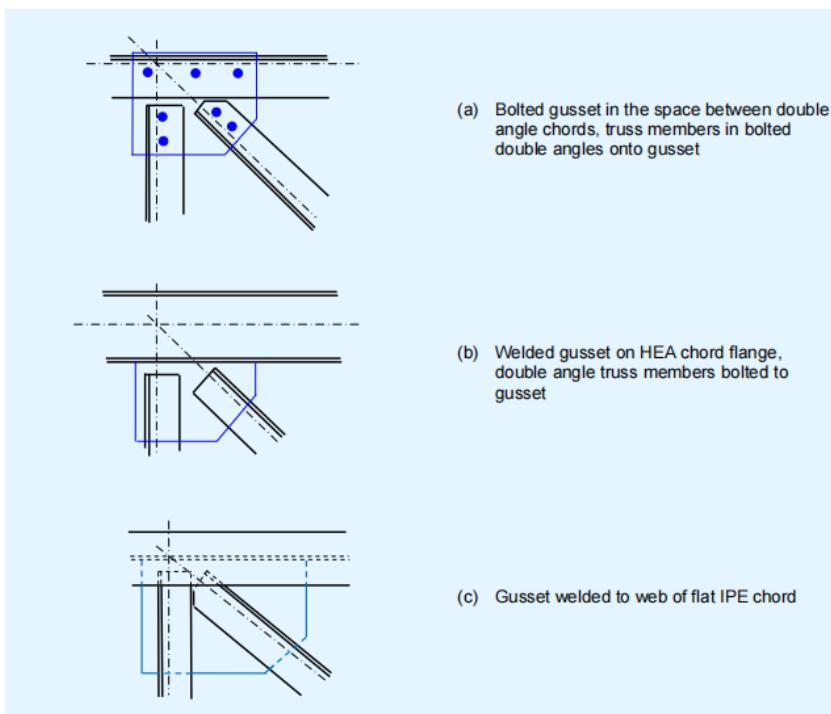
Truss connections on chord. Retrieved from Figure 5.5 of Single-Story Steel Buildings Part 5: Detailed Design of Trusses, p. 5-49.
